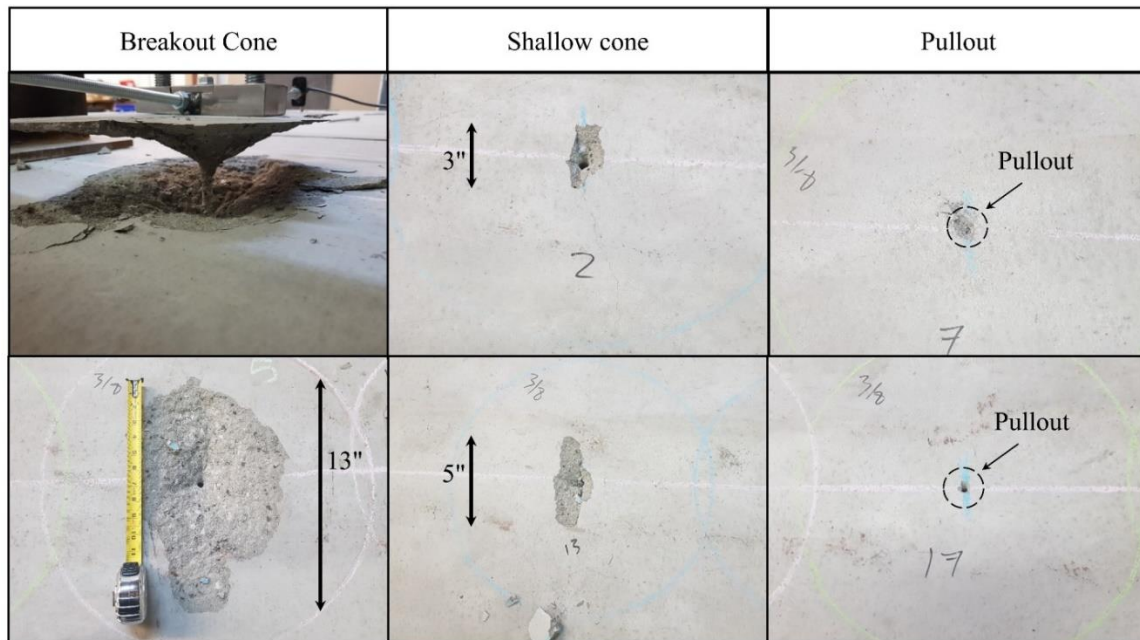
Observed failure modes in 4 in. thick concrete.
